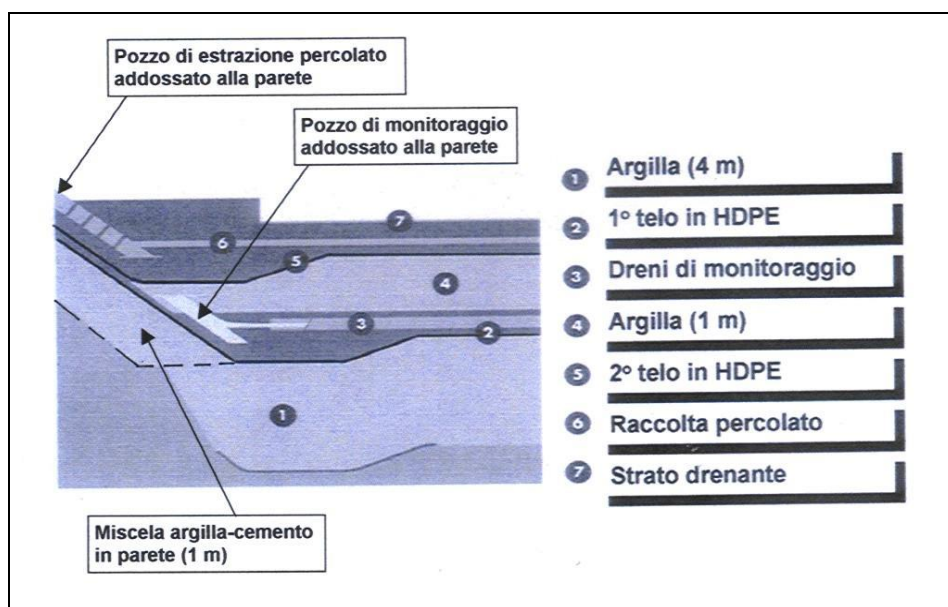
Sidewall and bottom liners with monitoring and leachate drainage systems.
